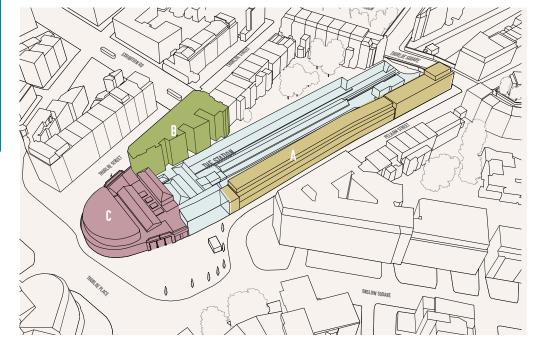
The Around Station Development (A – Pelham Street; B – Thurloe Street; C – Bullnose & Arcade)
